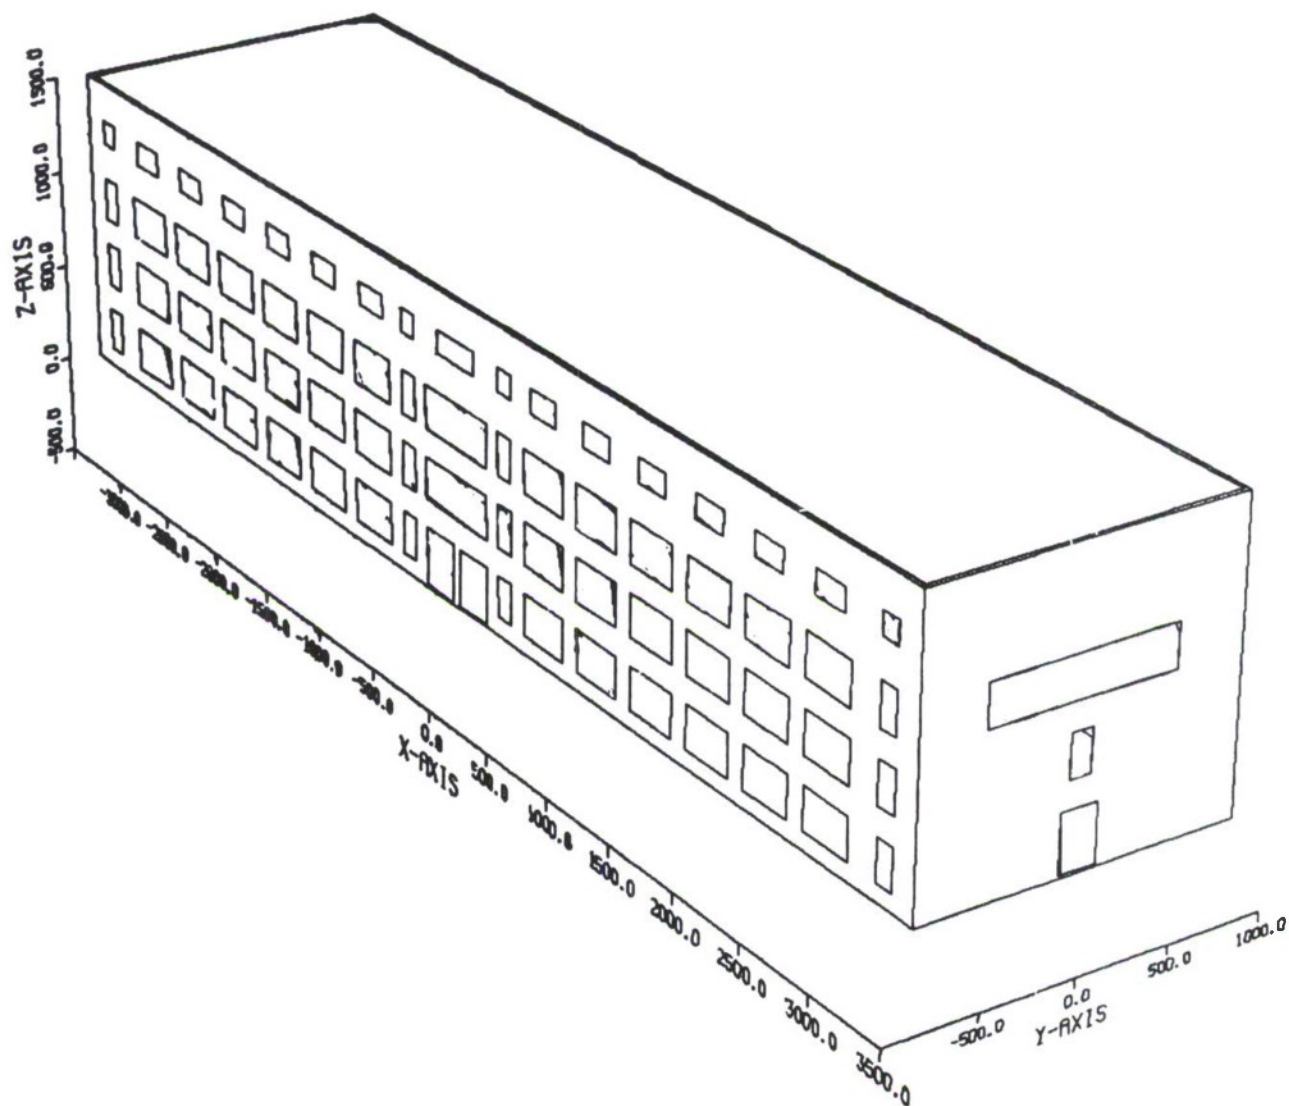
Discrete ordinates concrete building model of Building A (Chinzei School). (Dimensions in cm.)
